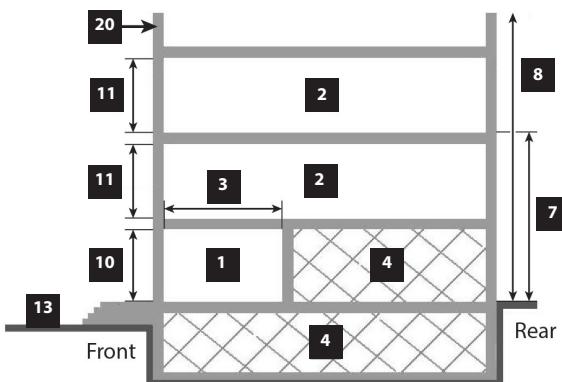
General building height and use diagram shown with basement and rear building interior parking, stoop entry type, and parapet roof type. Not to scale.
